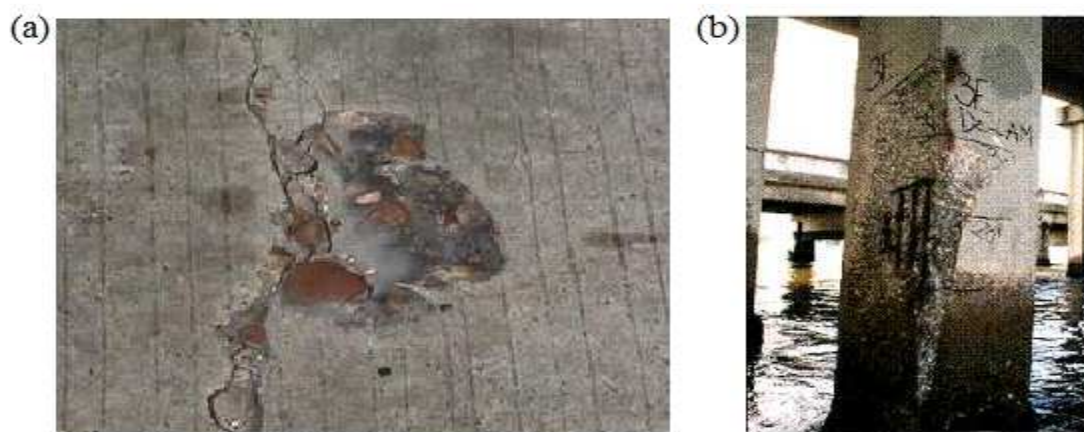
Damages induced by corrosion (a) concrete cracking (b) concrete spalling.
